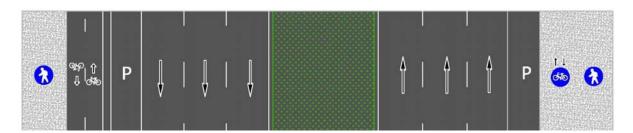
G: Old Colony Avenue Alternative A.1 Cross Section
